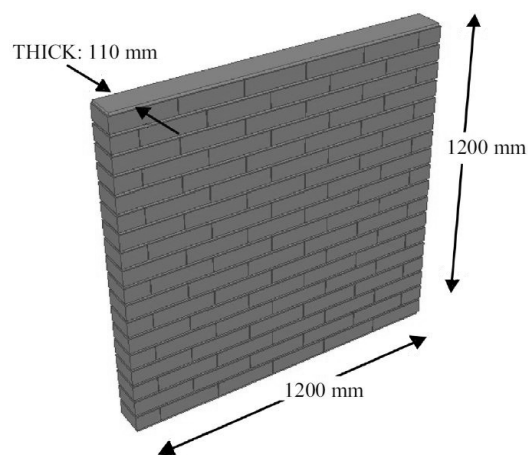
Benchmark configuration (un-strengthened URM wall).
